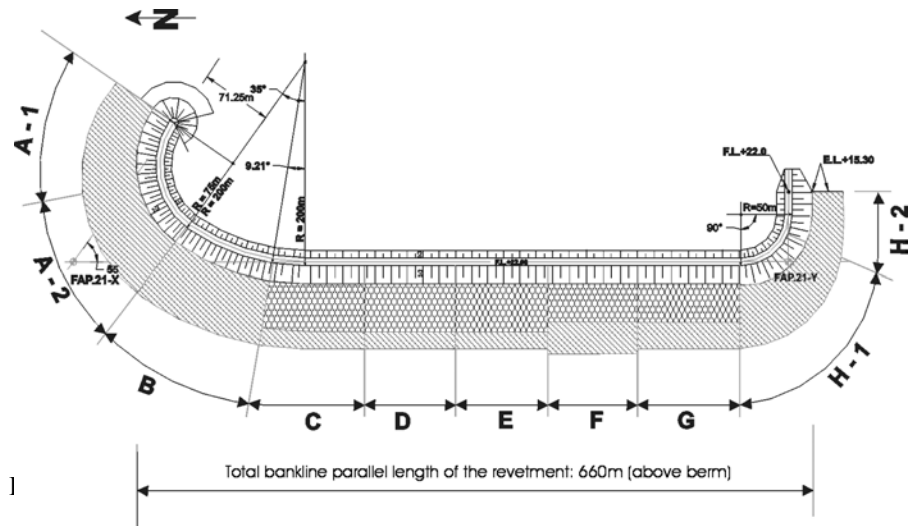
Plan view of Bahadurabad test revetment. (FAP 21, 2001)
